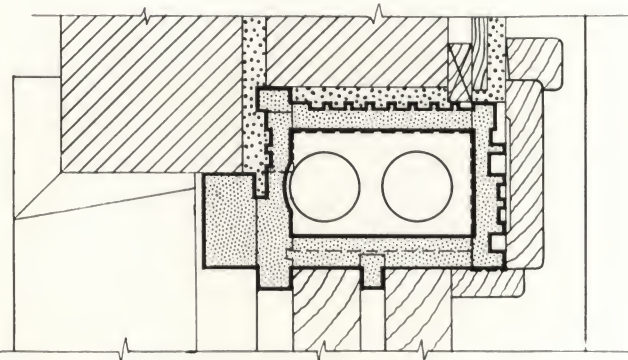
Box frame No. 671 in 8" two brick wall with lath and plaster on 1/2" furring strips.
